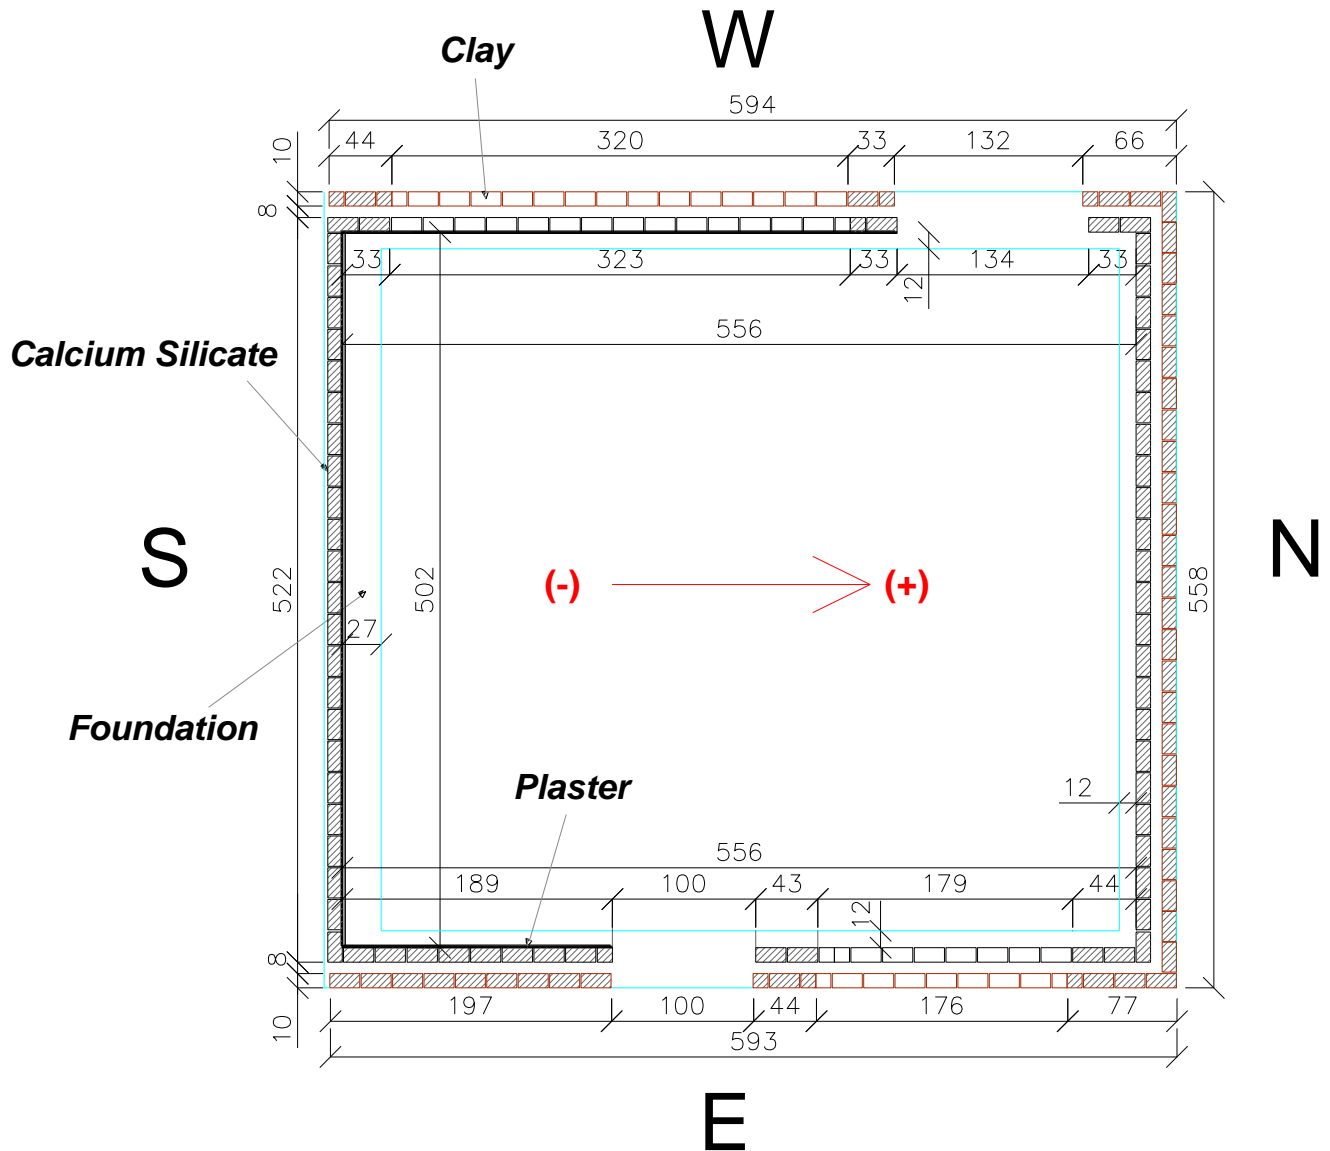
Plan view of the ground floor. The red arrow indicates the shaking direction. Units of cm.
